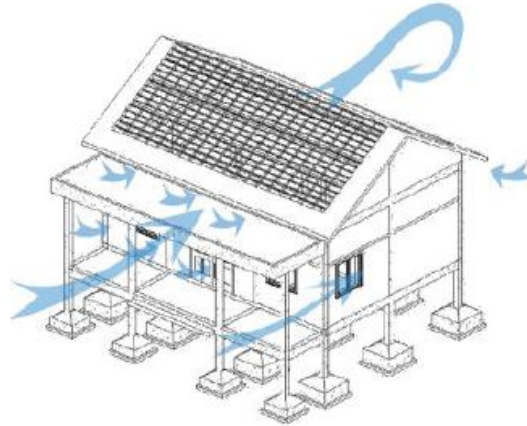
Three compartment house roof design & structure (Source: ISET, 2013)
